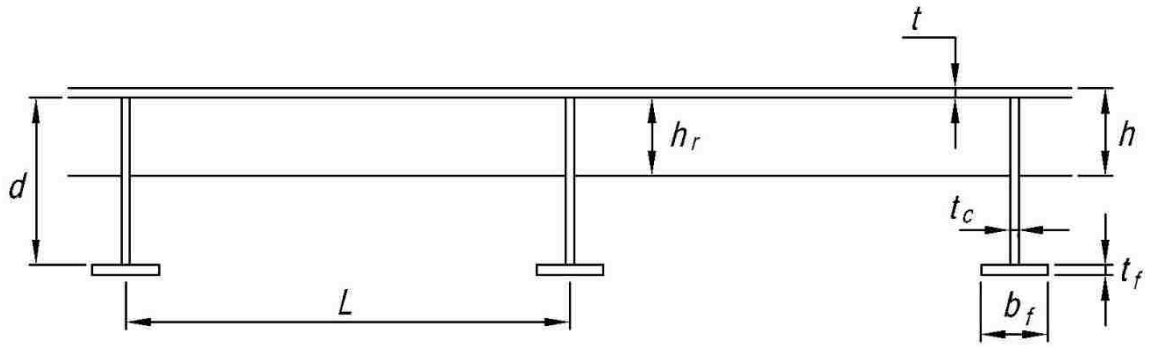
Common parameters of steel orthotropic bridge deck for all rib-to-floor beam connection types
